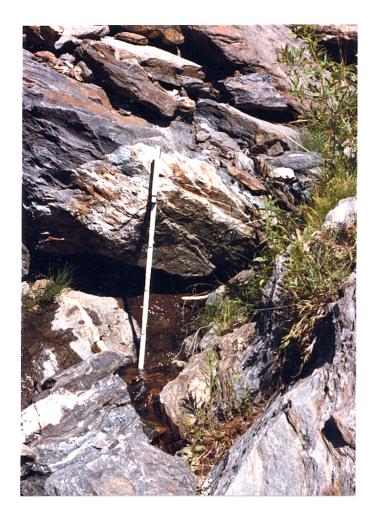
Seepage of about 1-2 gpm from toe dam on left side outlet pipe.
